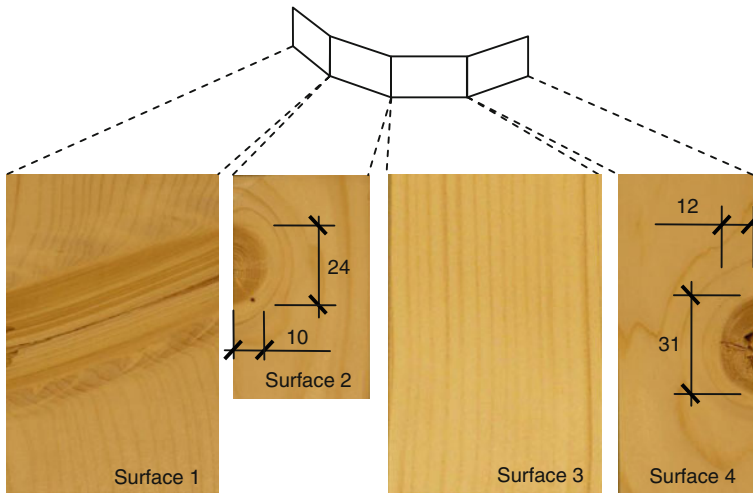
Knot dimensions (mm) in Edge knot specimen
